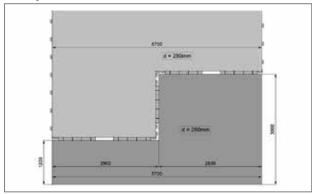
Schöck Isokorb® T type K-E, K-T: Geometry of the interior floor slab and balcony
